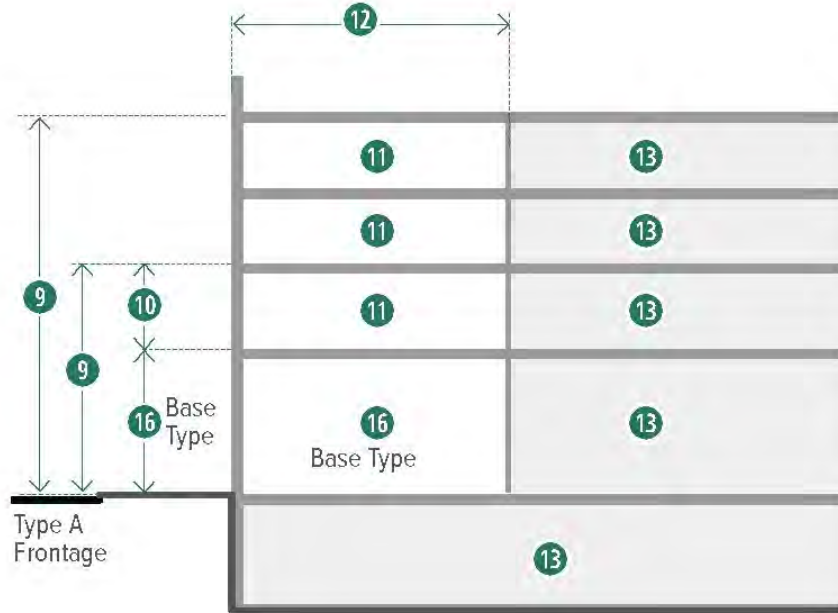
Main Street Storefront Building Section: Height & Use Requirements
